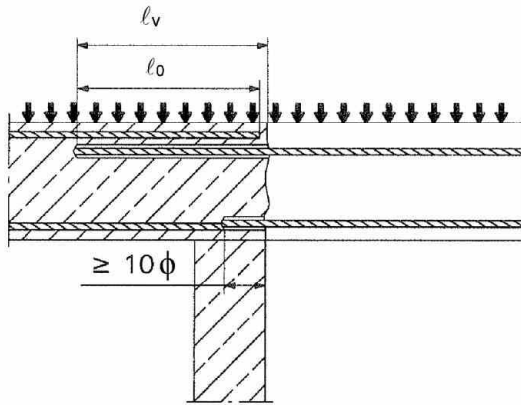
End anchoring of slabs or beams (e.g. designed as simply supported)
